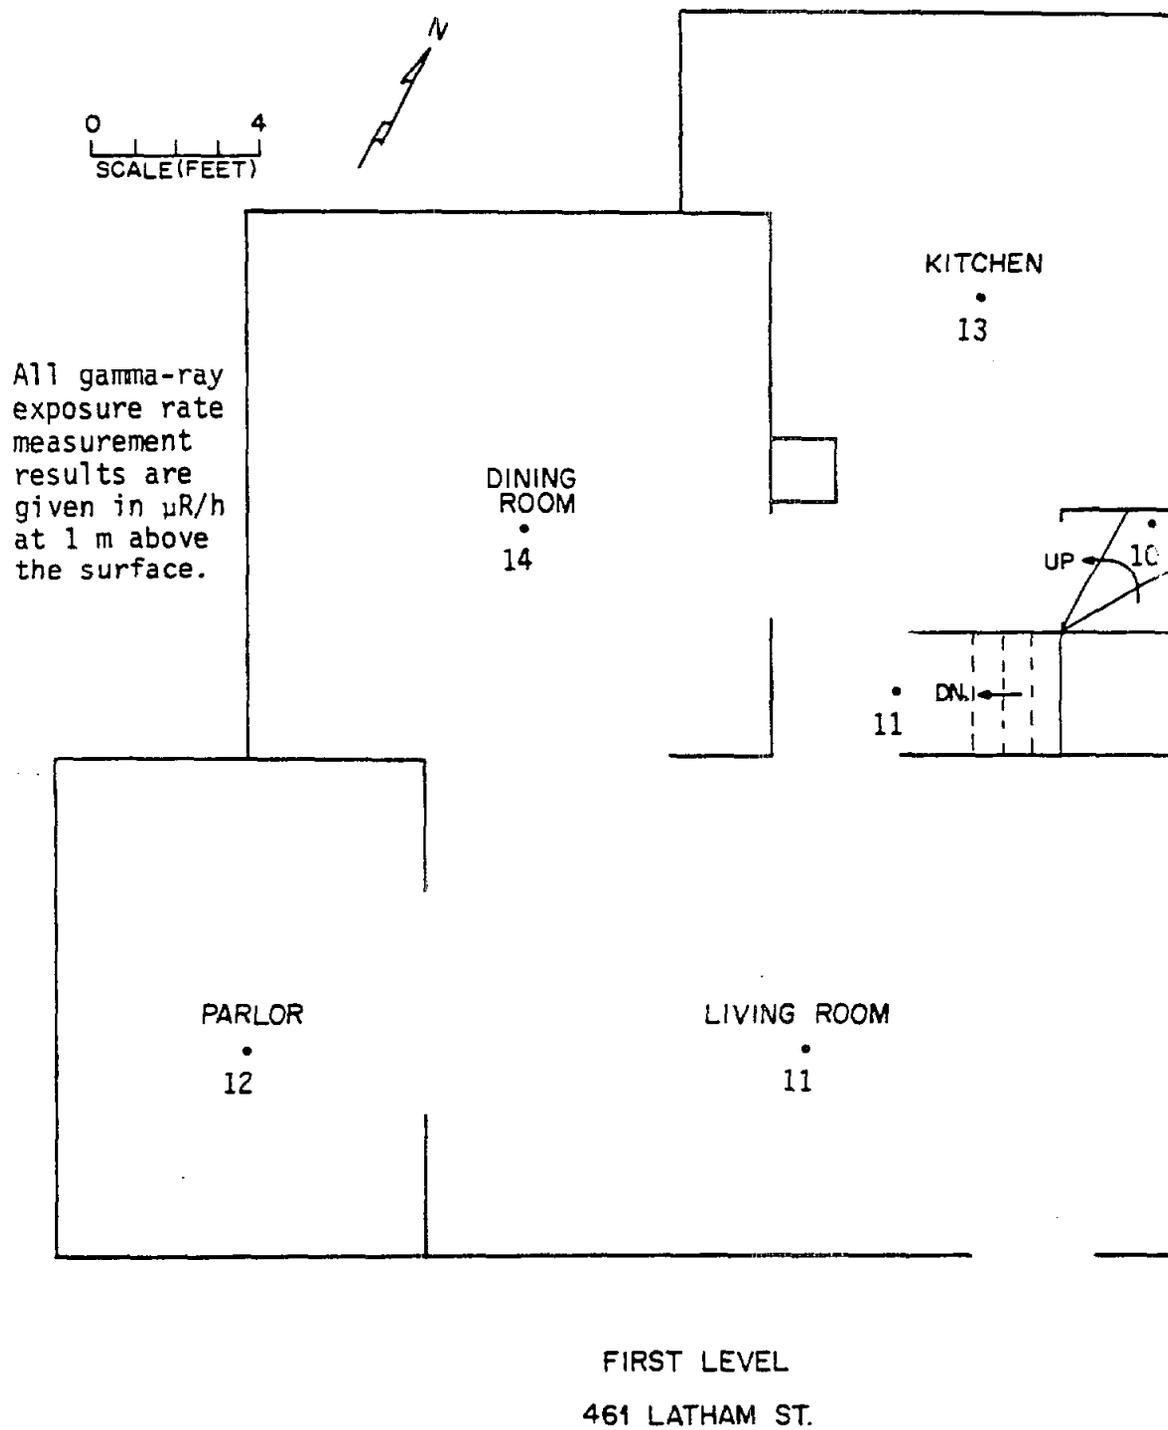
Schematic of the first level floor plan at 461 Latham Street
